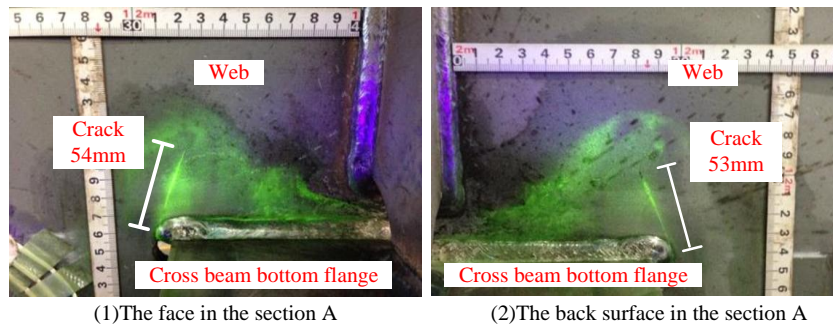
Fatigue crack at 2.5 million cycles.
